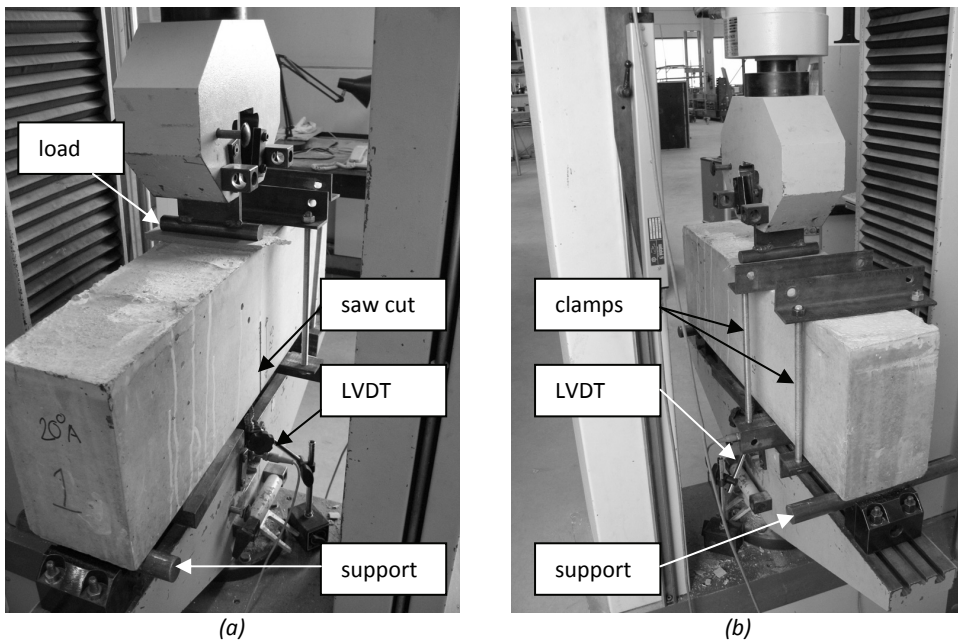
Non-clamped (a) and clamped (b) side of the three-point bending test specimen in the test setup
